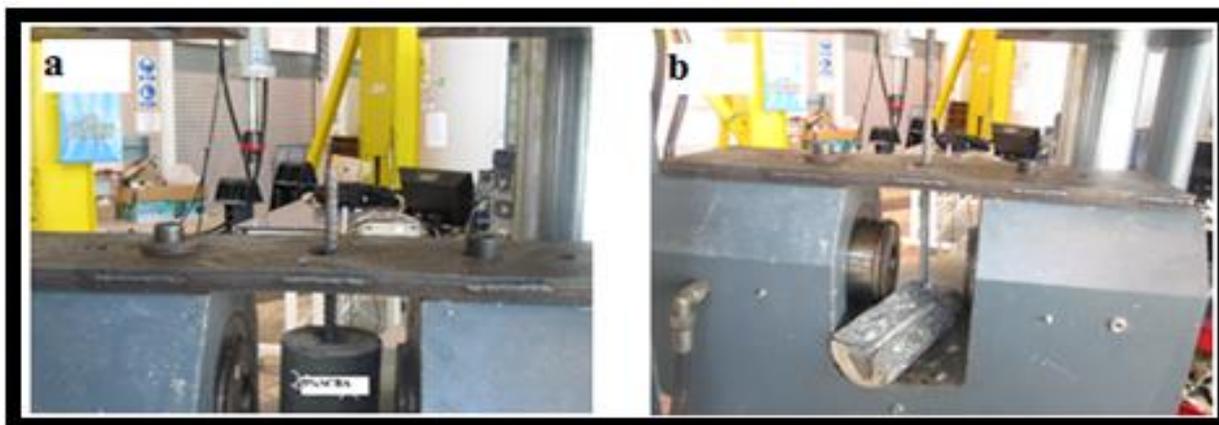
(a) Steel rupture failure (b) Splitting and pullout failure
